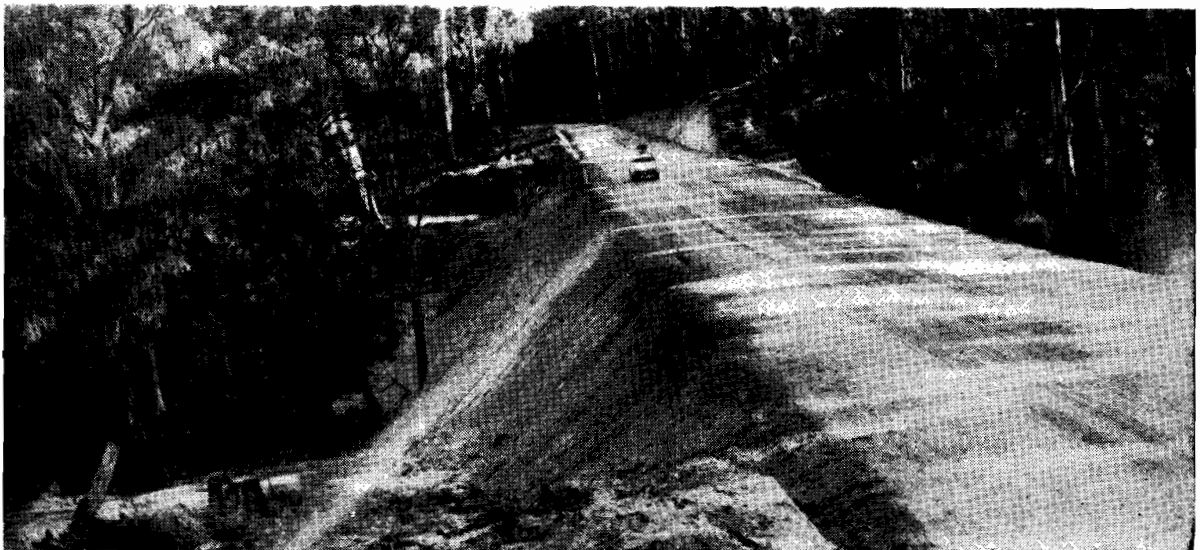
A reconstructed and re-aligned section of the Yarram-Traralgon Road, north of Won Wron.
